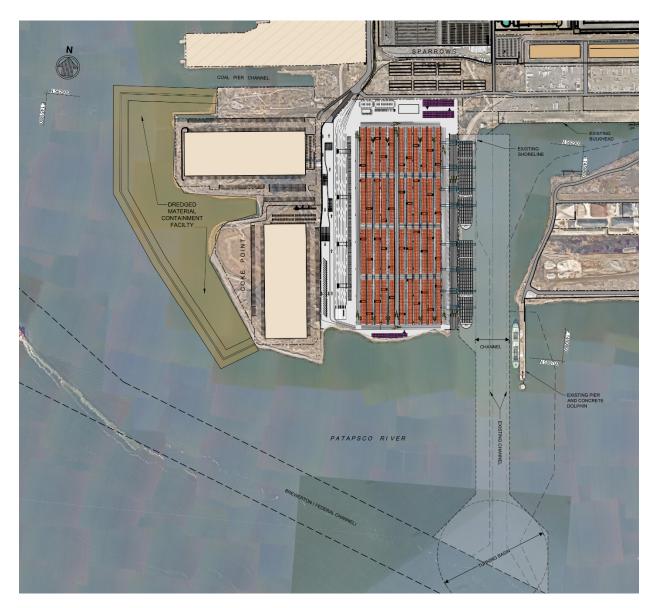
Sparrows Point Container Terminal General Arrangement and Offshore DMCF
